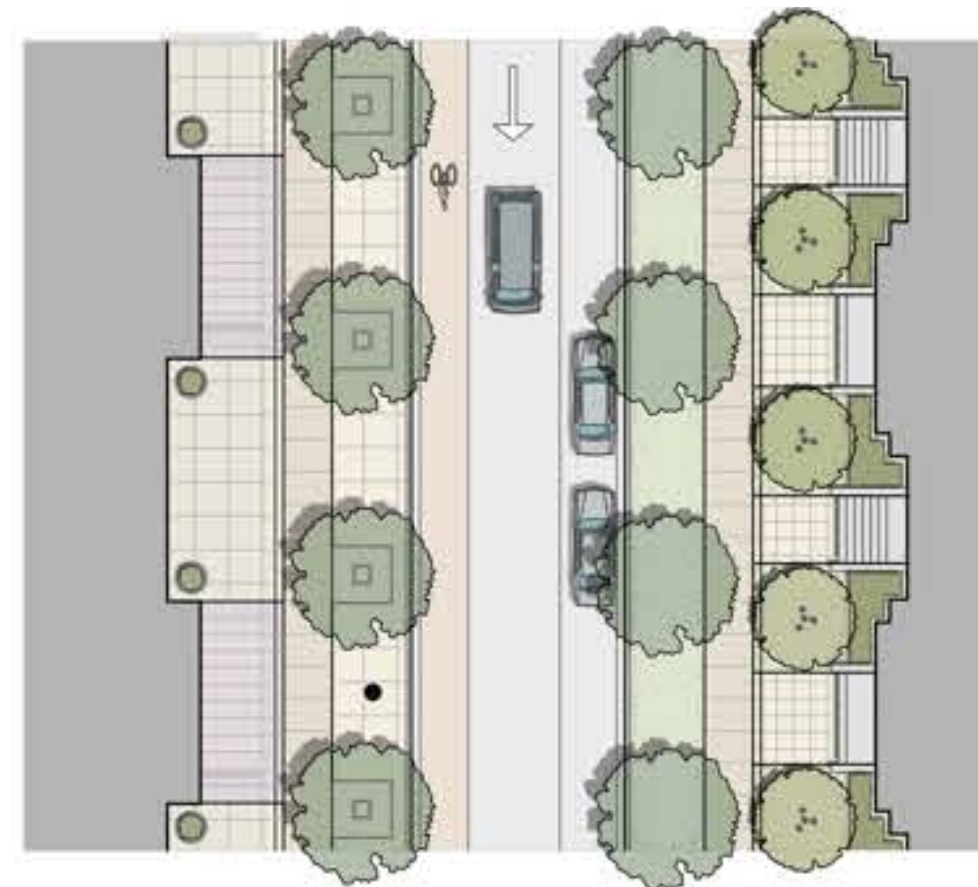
18.0m ROW - one way thru lane; on-street bike lanes; side walk on both sides of the street; on-street parking and double row of street trees in grass boulevard.
